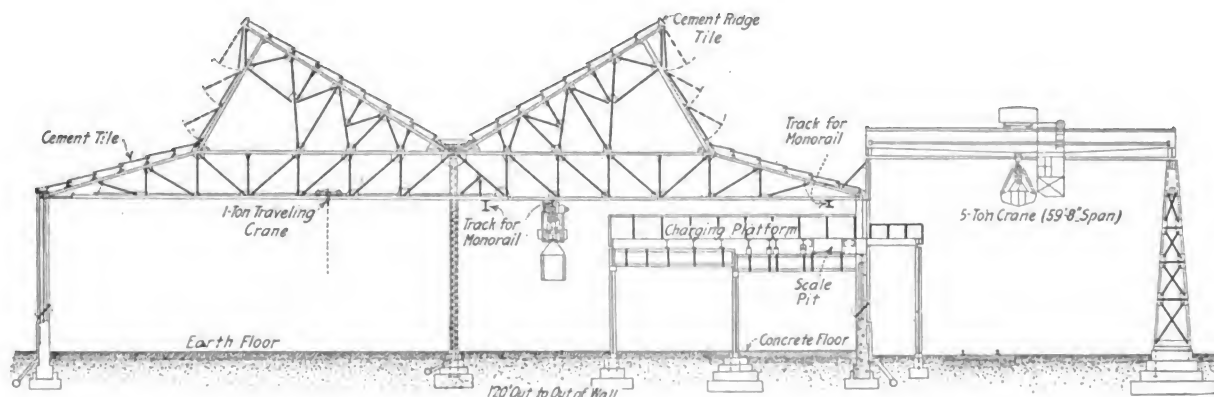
Roof construction and general design of the building of the Nash Motors Company, as shown by the cross-section
